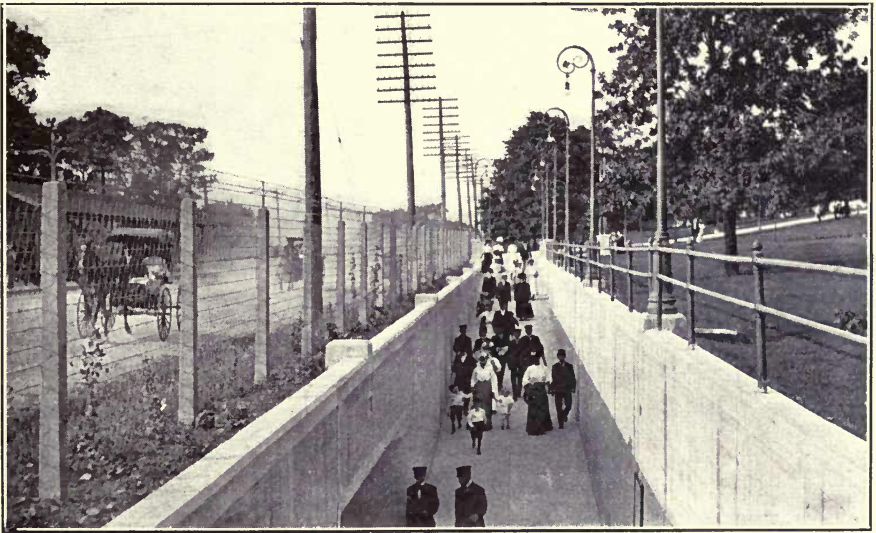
RETAINING WALLS AT DELLWOOD PARK, JOLIET, ILL.
